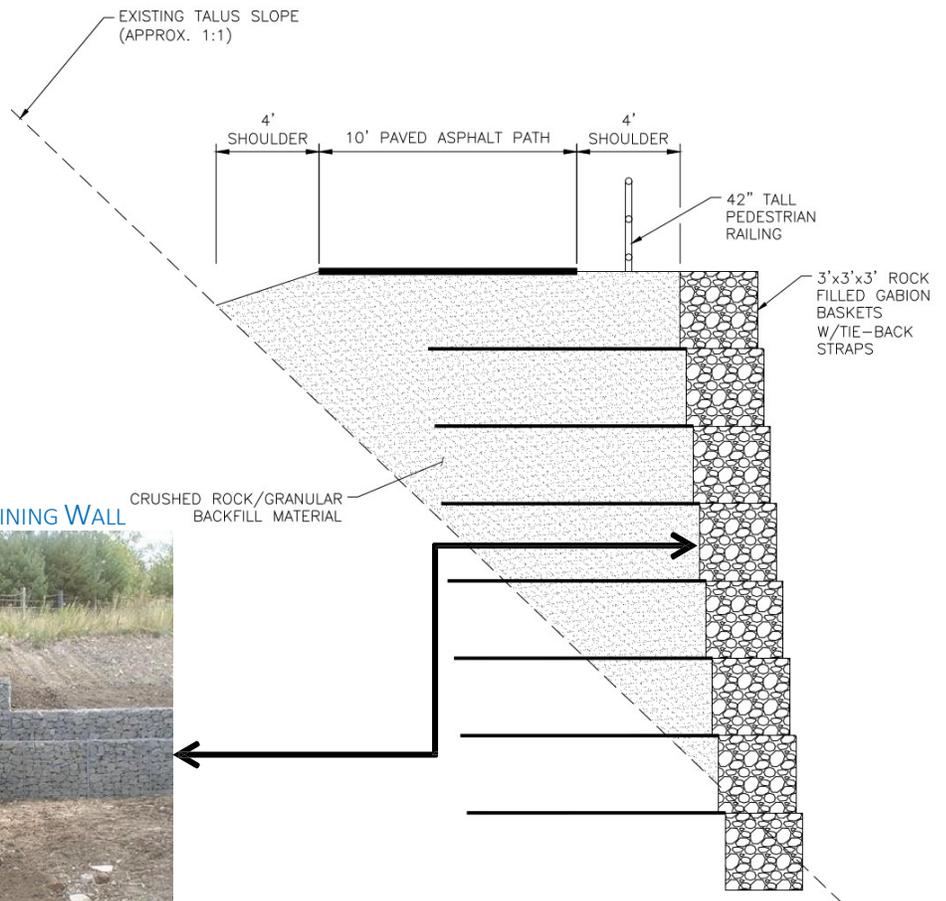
EXAMPLE GABION RETAINING WALL
